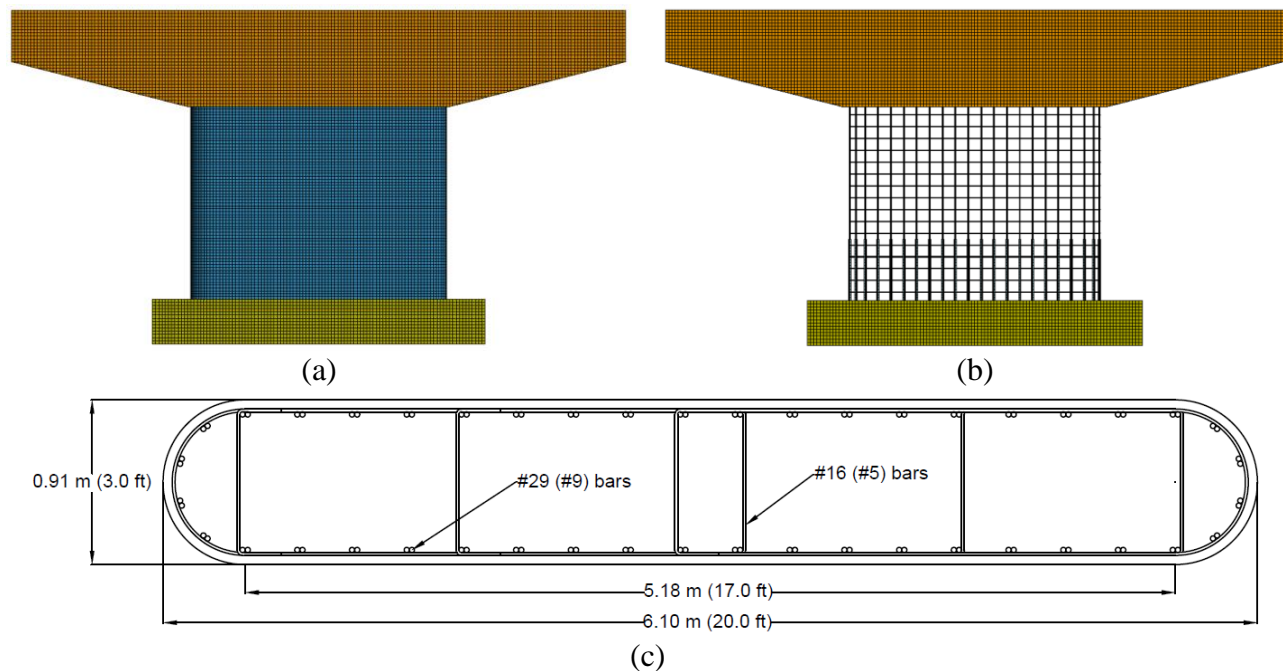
Details of the T-pier's column: (a) concrete, (b) column steel reinforcement, and (c) column cross-section
